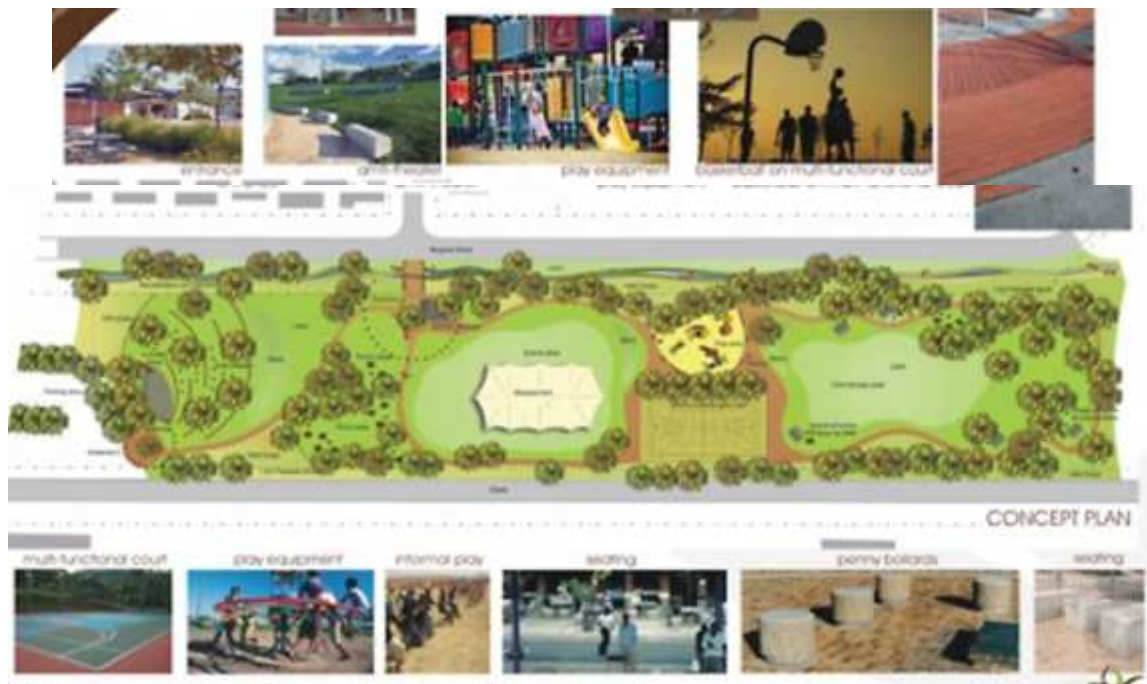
Ikageng Community park concept plan (Outlining landscape architecture, 2013)
